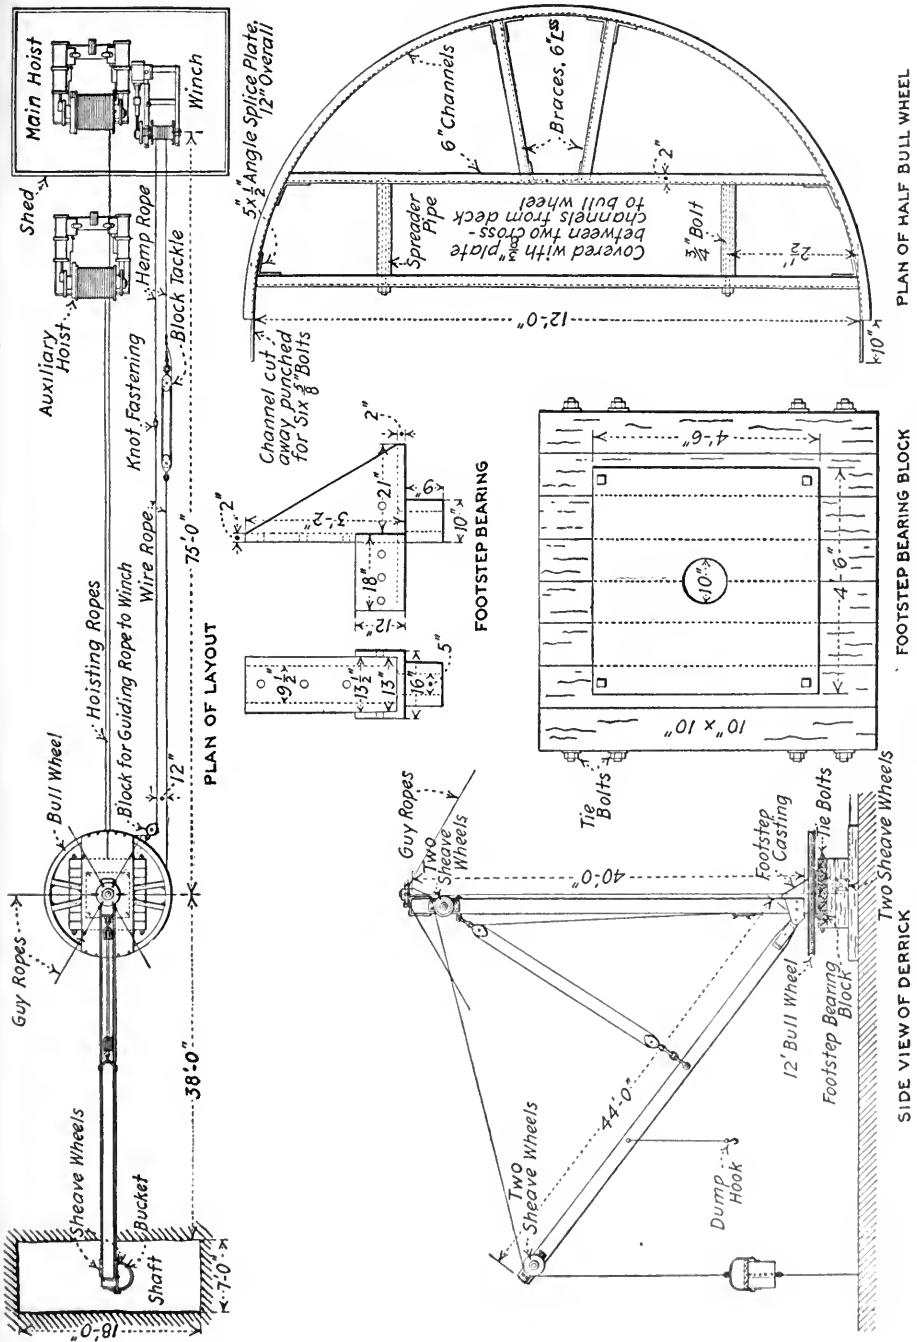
LAYOUT AND DETAILS OF SINKING DERRICK.
